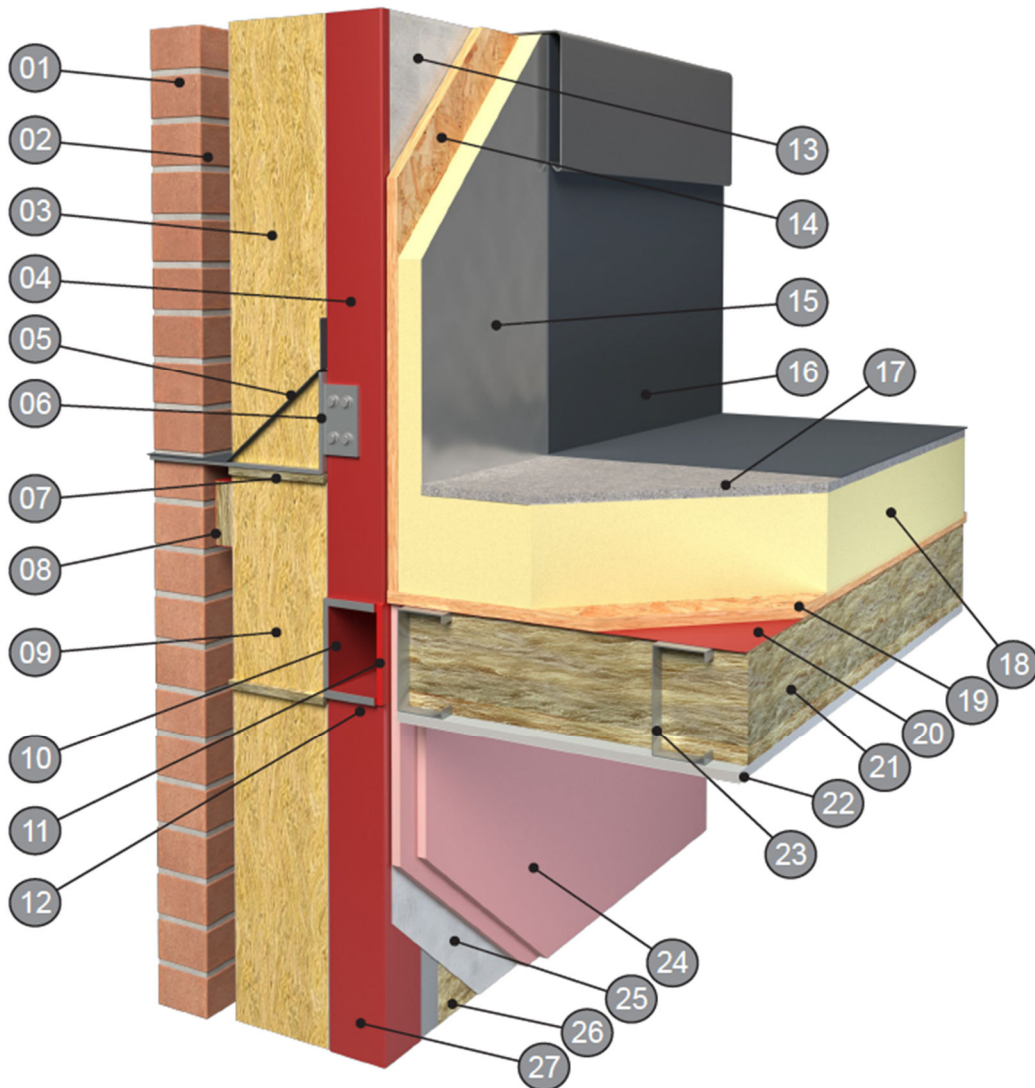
External wall with traditional brick/block outer leaf cladding to roof detail
